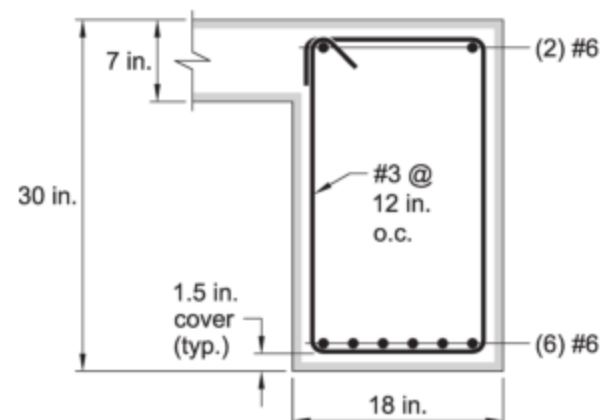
Section B-B through Beam B2 near connection with Beam B1.
